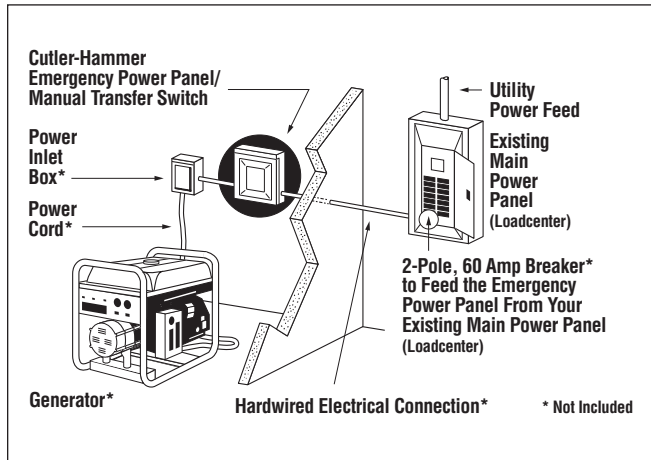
Manual Transfer Switches — Outdoor Installation Diagram
